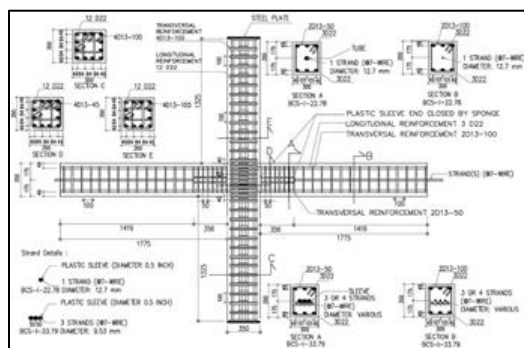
Detail specimens of interior beam-column sub-assembly.
